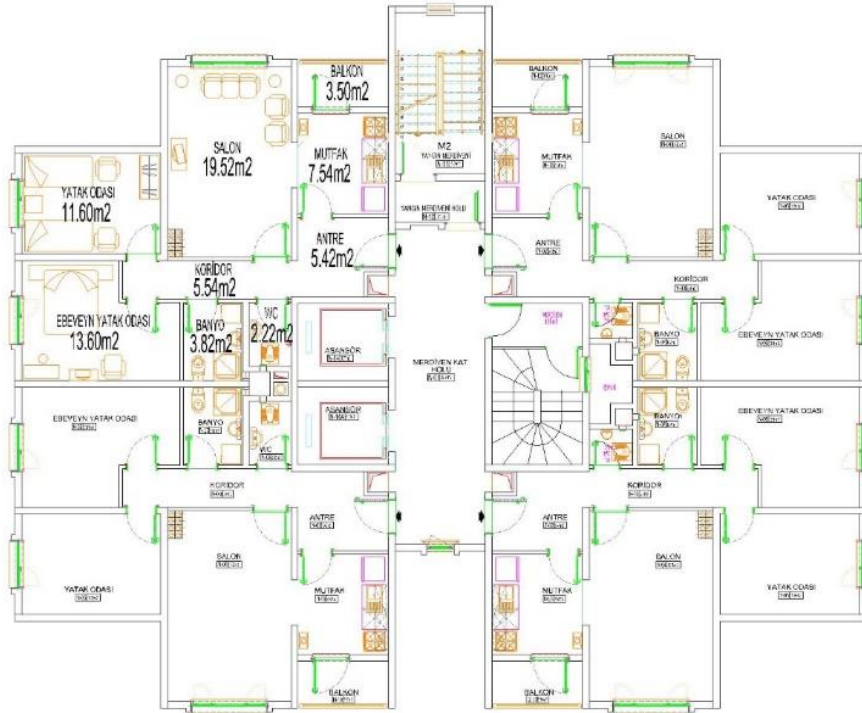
Floor plan of the social housing archetype (Ankara Turkuaz Project B2 type floor plan) (Url-4)
